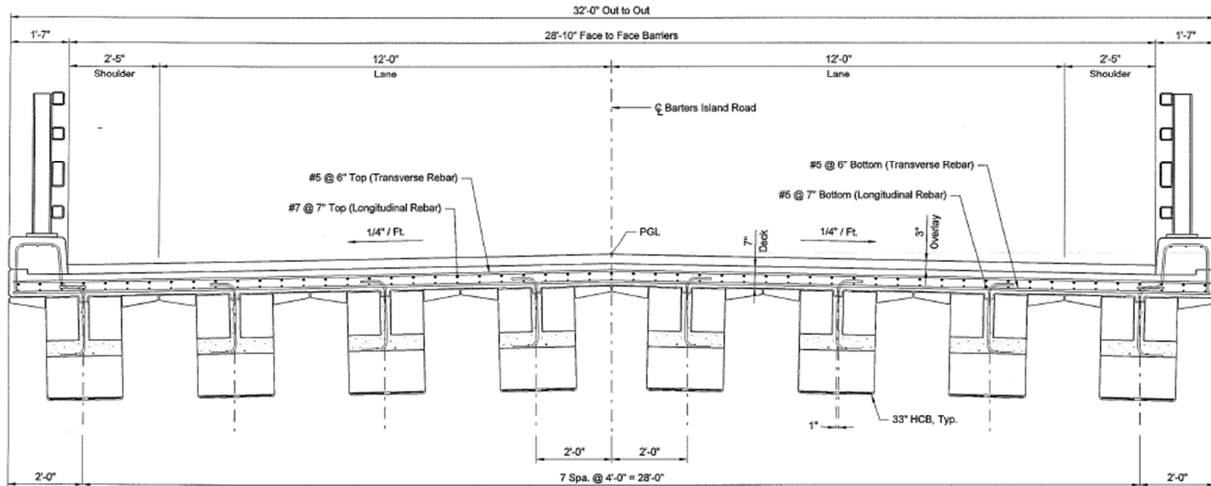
Knickerbocker Bridge Cross Section (MDOT 2009)
